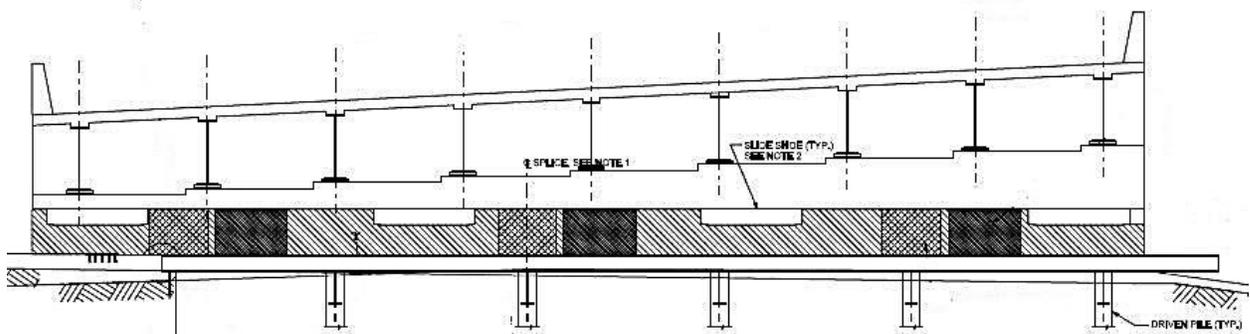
Side view of the I-80 Summit Park WB bridge temporary substructure
